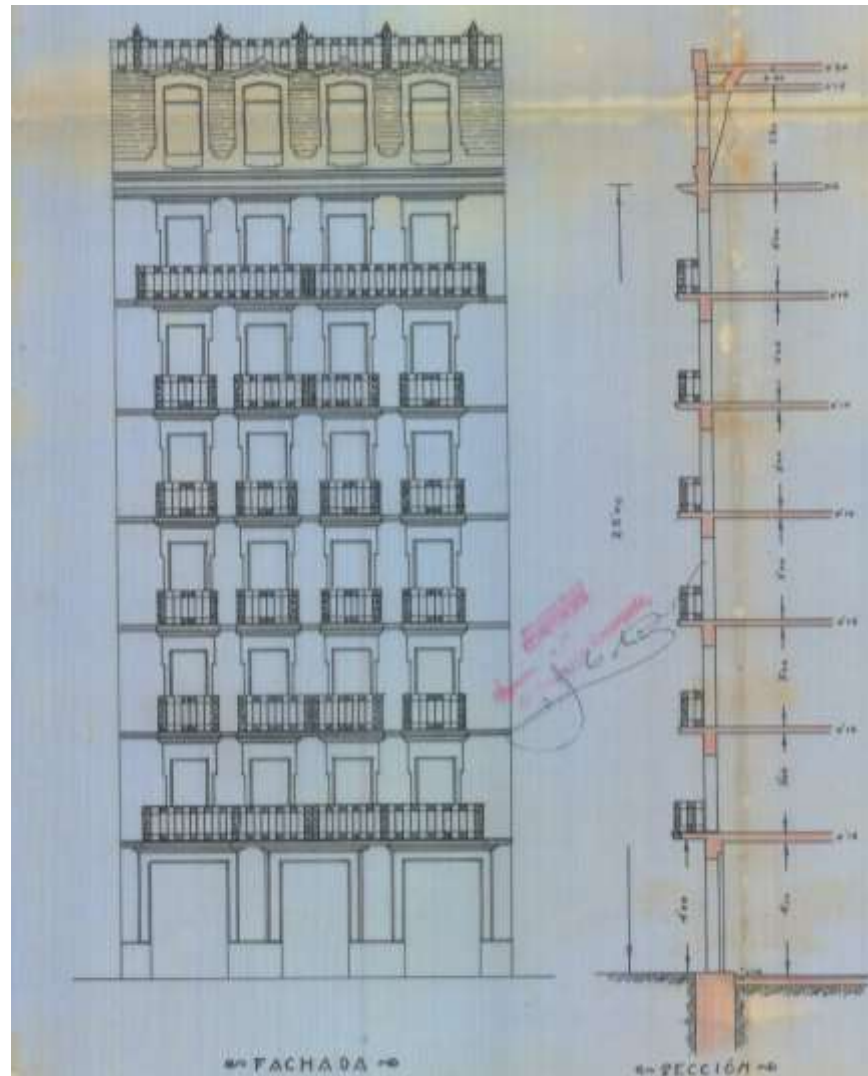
Facade and Section of masonry building of Villaruel Street 231.
